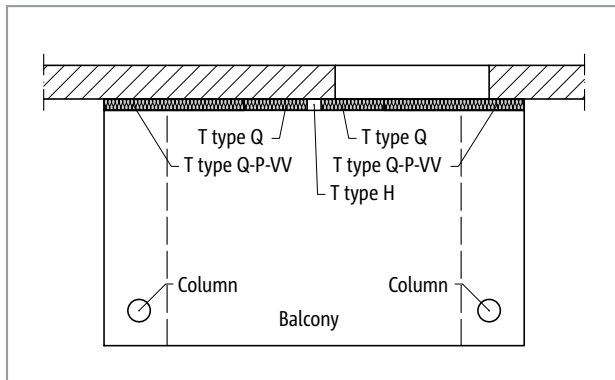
Schöck Isokorb® T type Q-P-VV, Q: Balcony with column support, connection with various bearing stiffnesses; optionally with T type H
